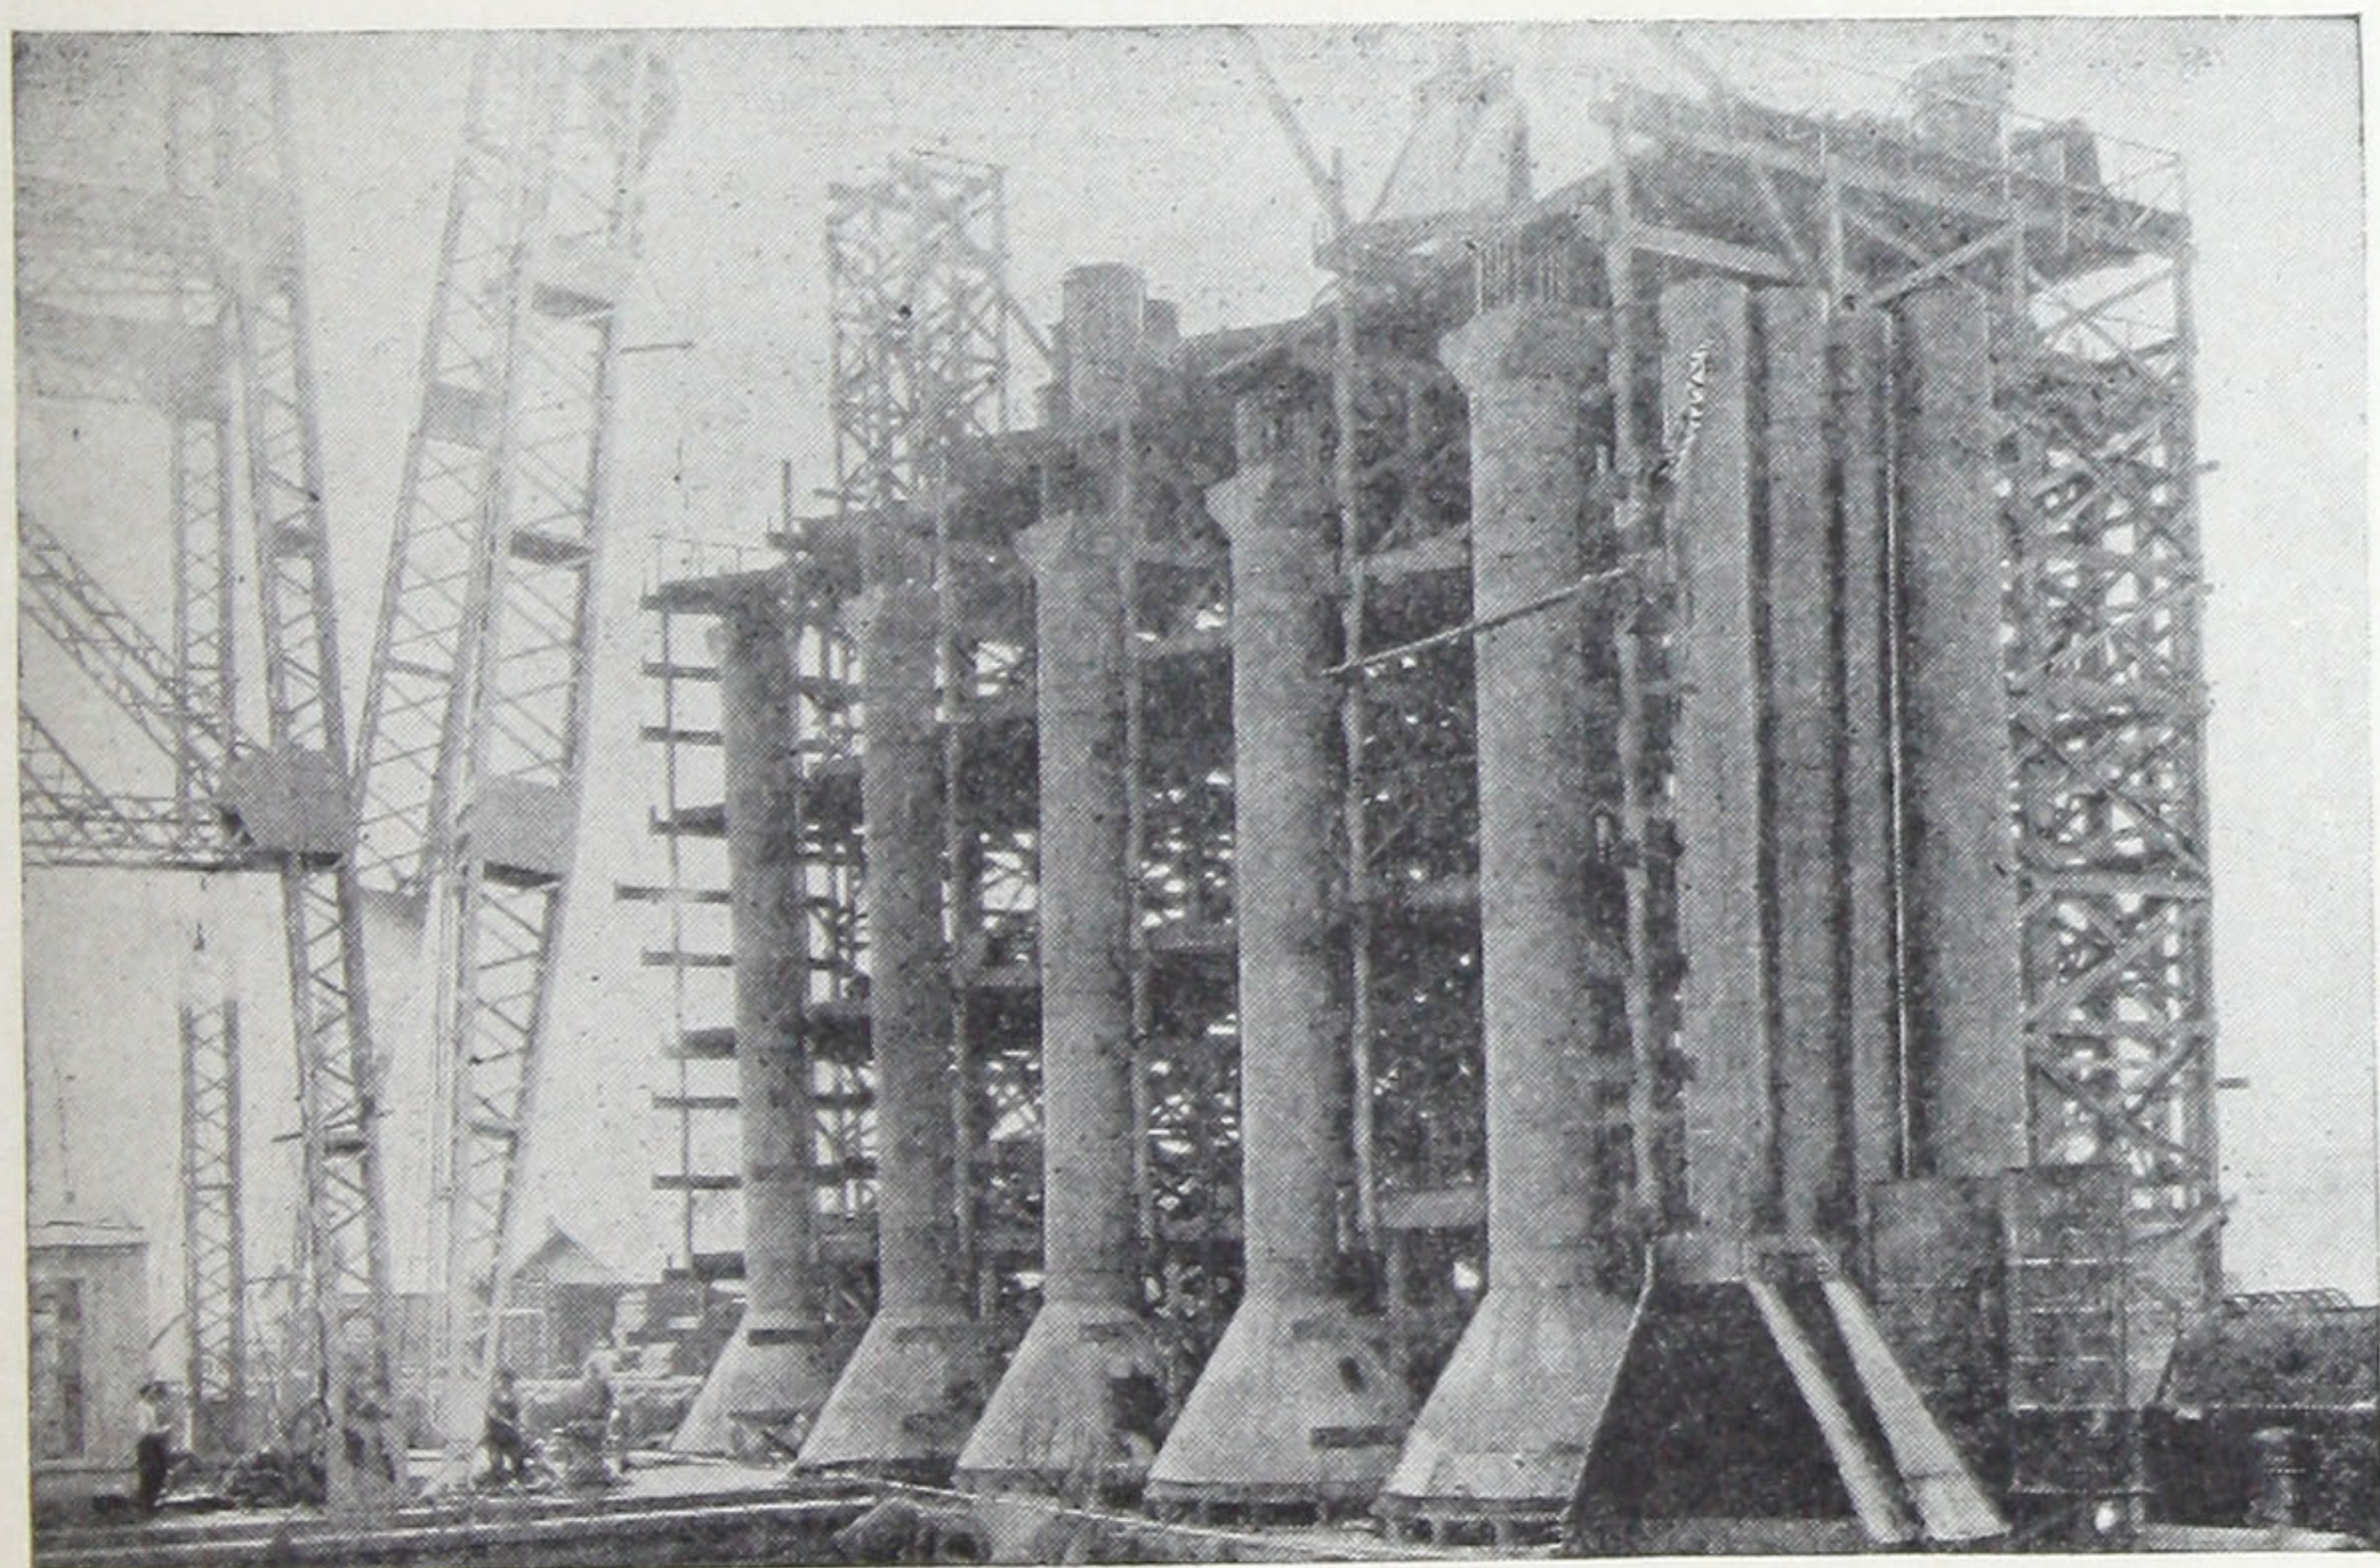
Enormous precast piers used at Bremerton, Washington. By means of Lumnite Cement these piers could be handled 24 hours after casting.
